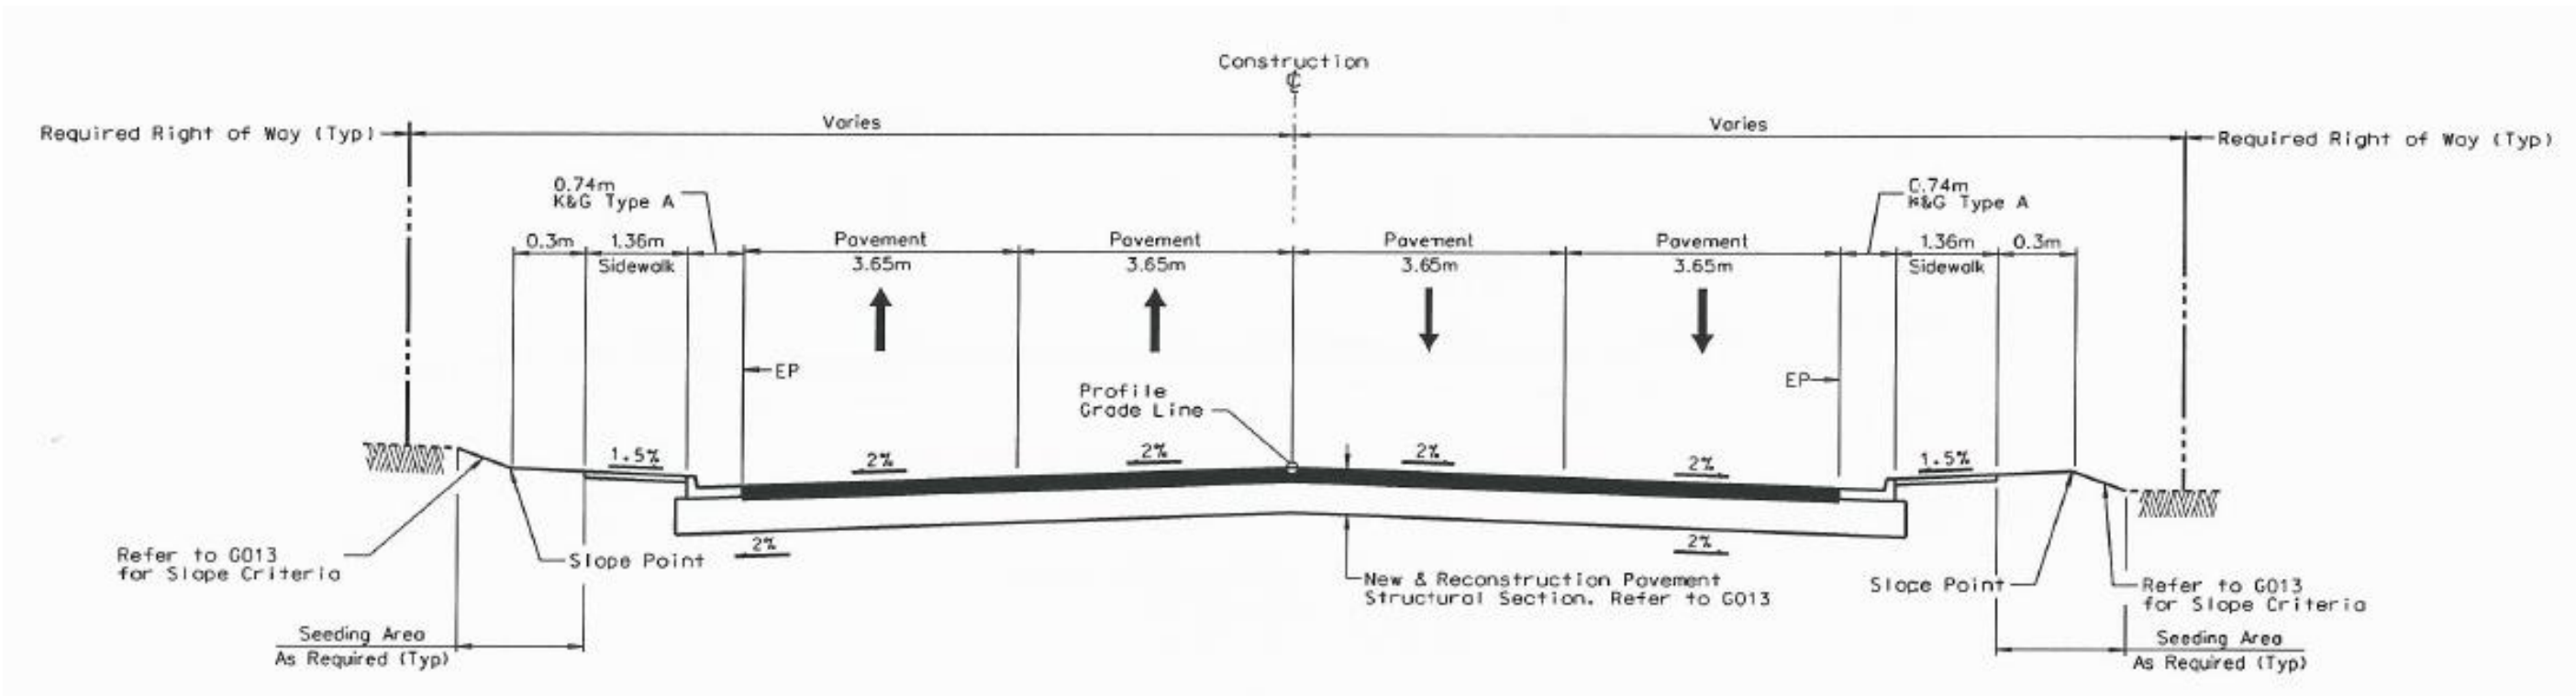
Typical road section between chainage 101+095 and 101+289, with a design speed 65 km/h
